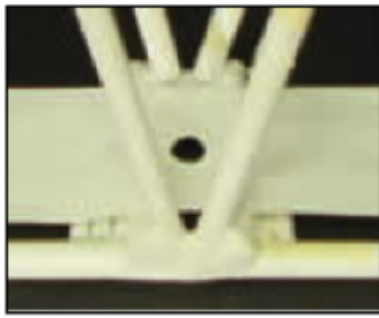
The loading platform will be positioned above the loading zone at the centre of the bridge.
